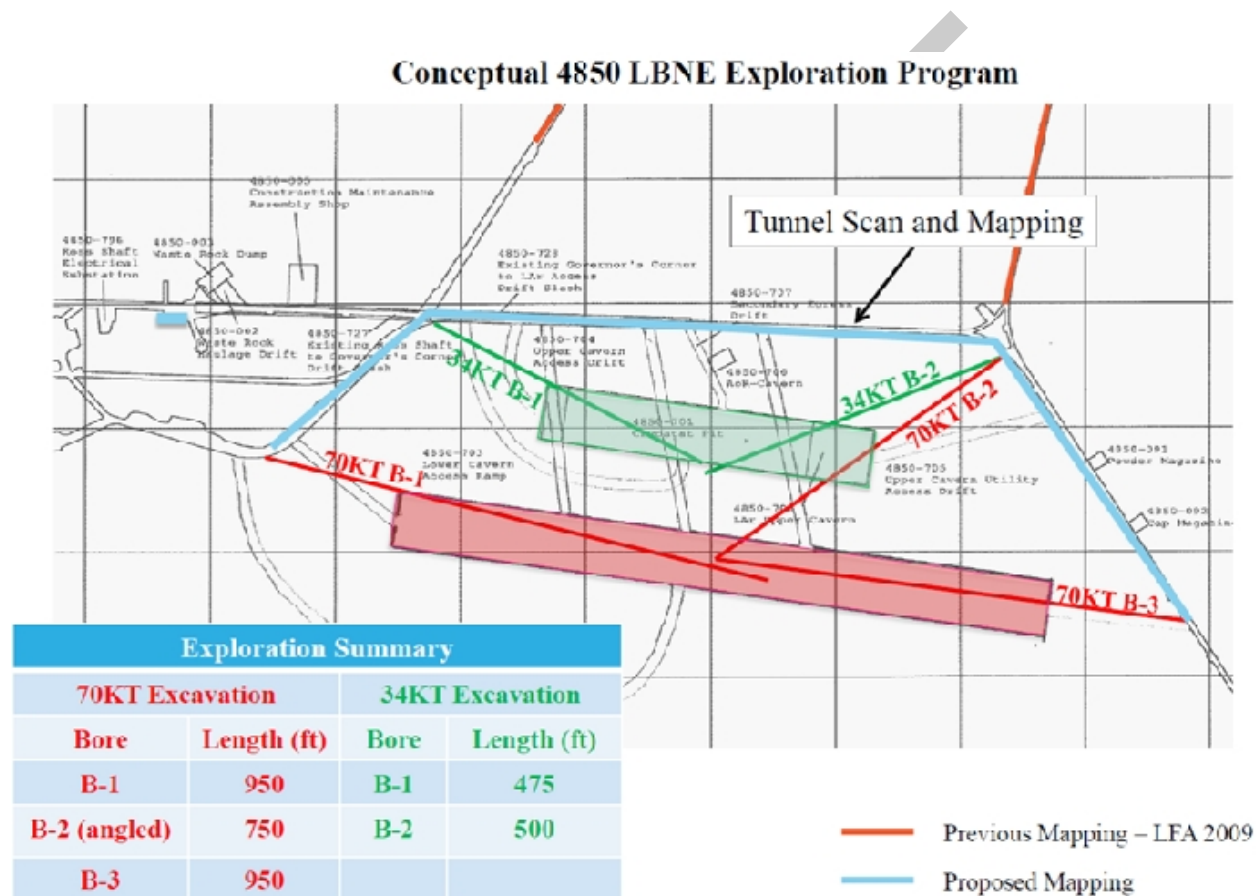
Possible layout and proposed geotech exploration for a 70+34 kton LAr detector modules.
